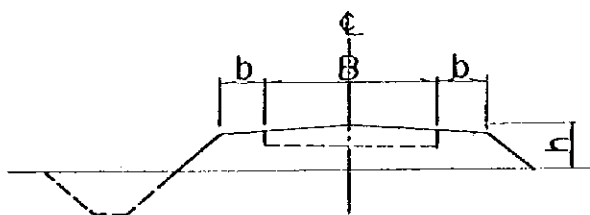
Fig. IV - II TYPICAL ARRANGEMENT AND TYPICAL SECTION OF ROADS
